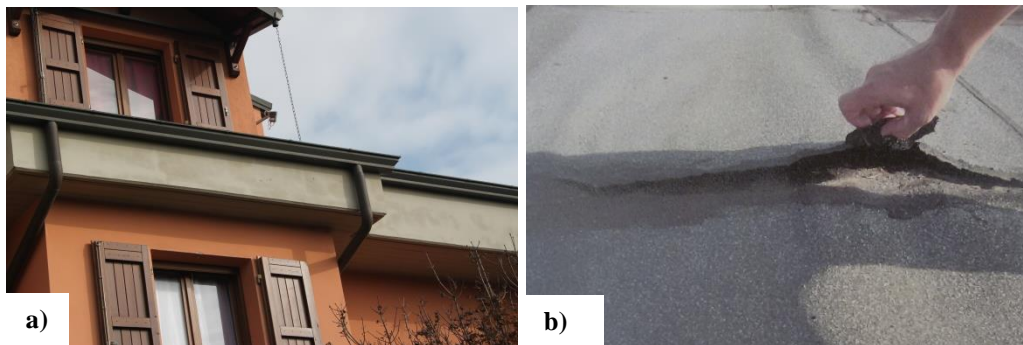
Example of waterproofing: a) Grout line; b) Membrane
